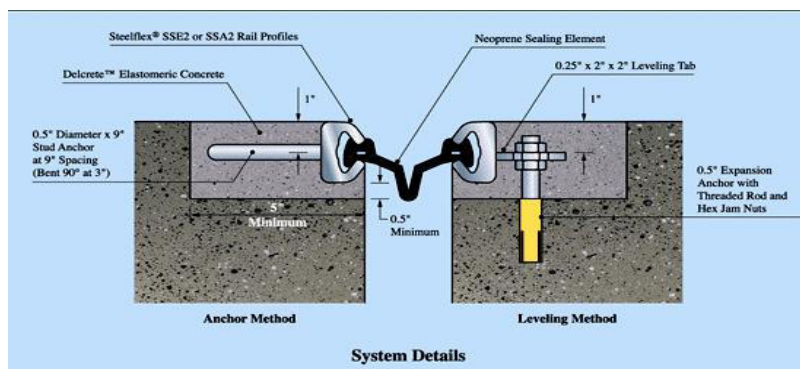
Cross Section of Strip Seal Type Expansion Joint
